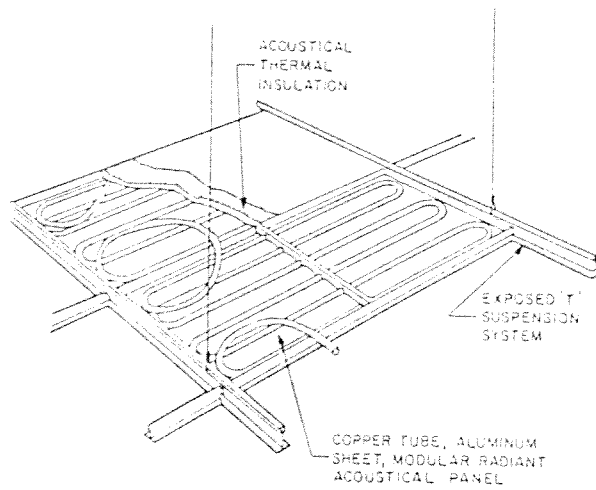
Metal Ceiling Panels Bonded to Copper Tubing
